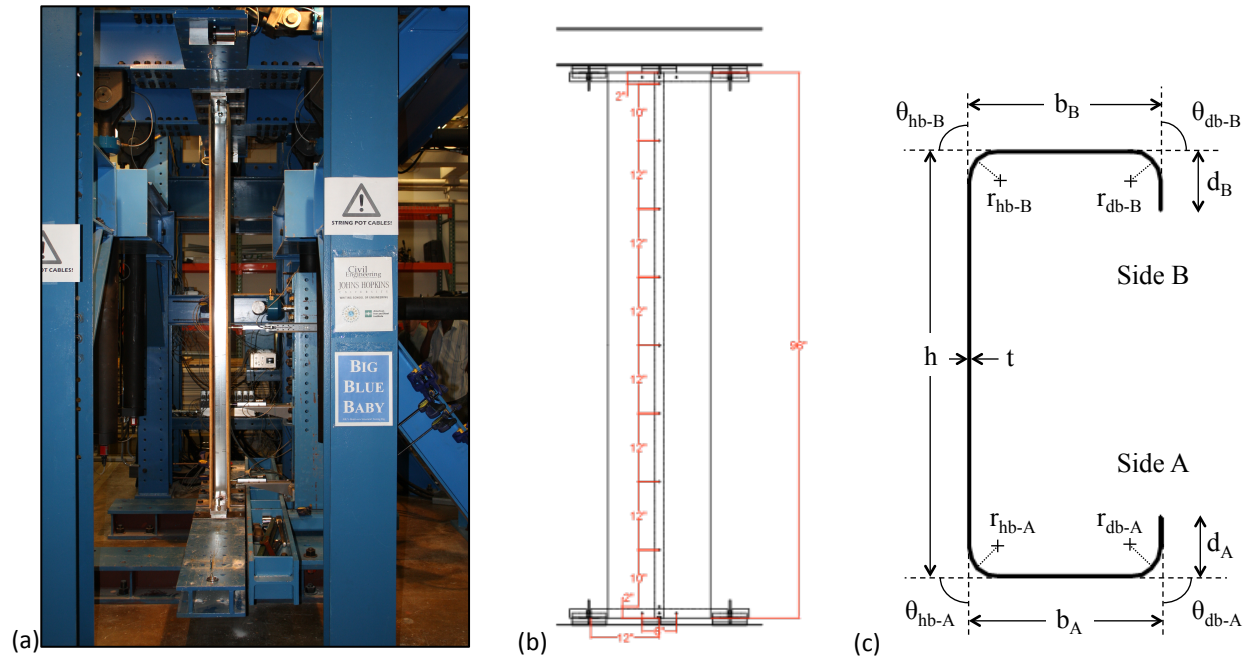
Typical specimen, tested under applied axial and lateral load (a) end elevation in testing rig, top beam is actuated, and lateral load applied by circular bar, (b) side elevation with fastener spacing and track to testing rig detailed, (c) dimensional nomenclature of tested stud
